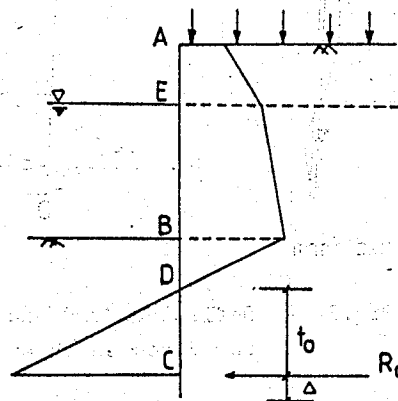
Stress distribution for Cantilevered sheet pile for Fixed earth support condition
